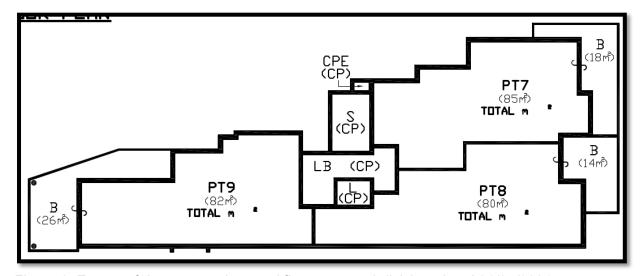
Extract of the proposed second floor strata subdivision, dated 21/04/2021.
